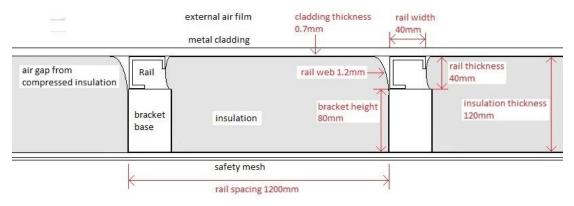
TYPICAL ROOF RACK CONSTRUCTION - SIDE VIEW
